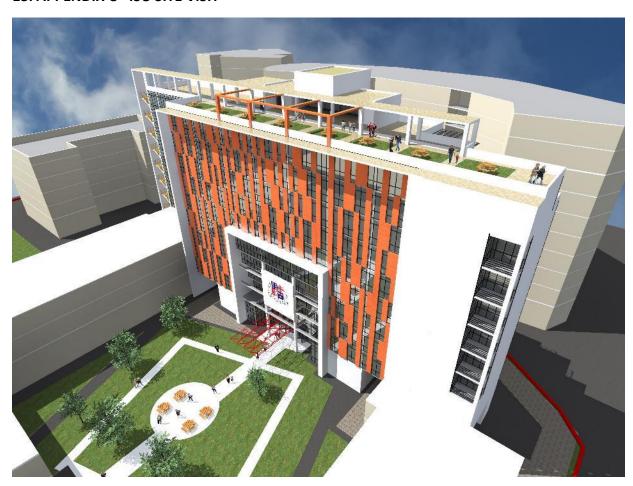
Render of Architects proposed building design at ISU on Chokolashvili Street site.
